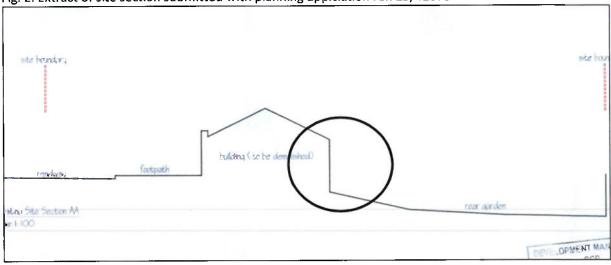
Extract of site section submitted with planning application ref. 23/41878
